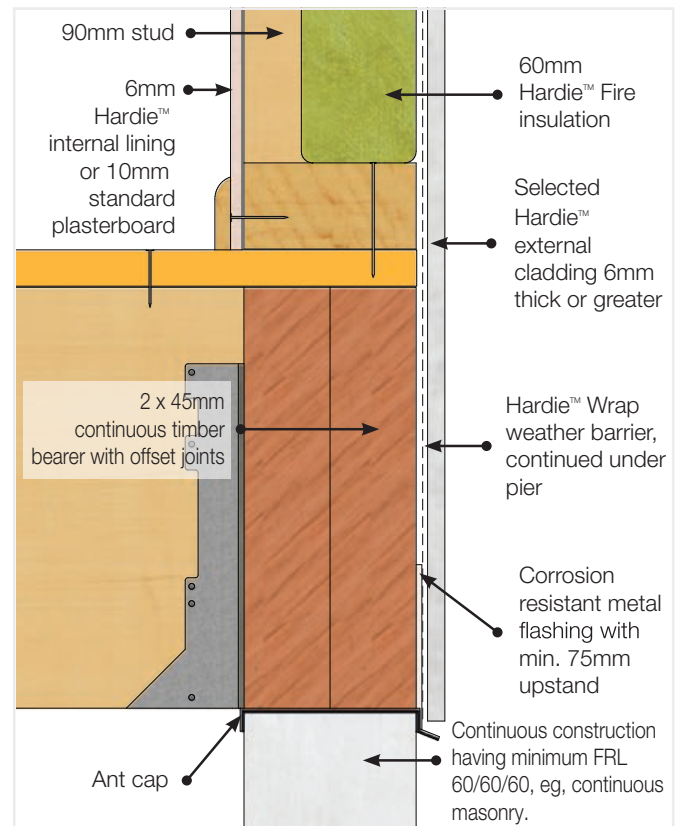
WALL BASE TO SUSPENDED GROUND FLOOR
